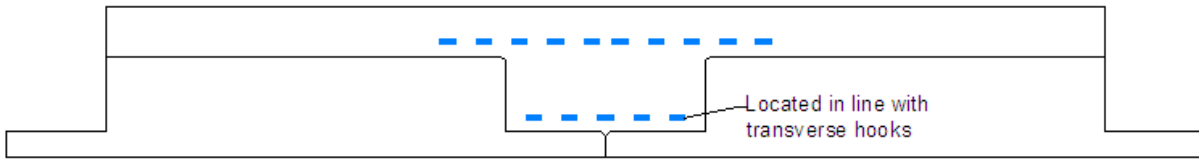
Instrumentation layout for Concept 1 laboratory bridge specimen (Smith et al. 2008)
